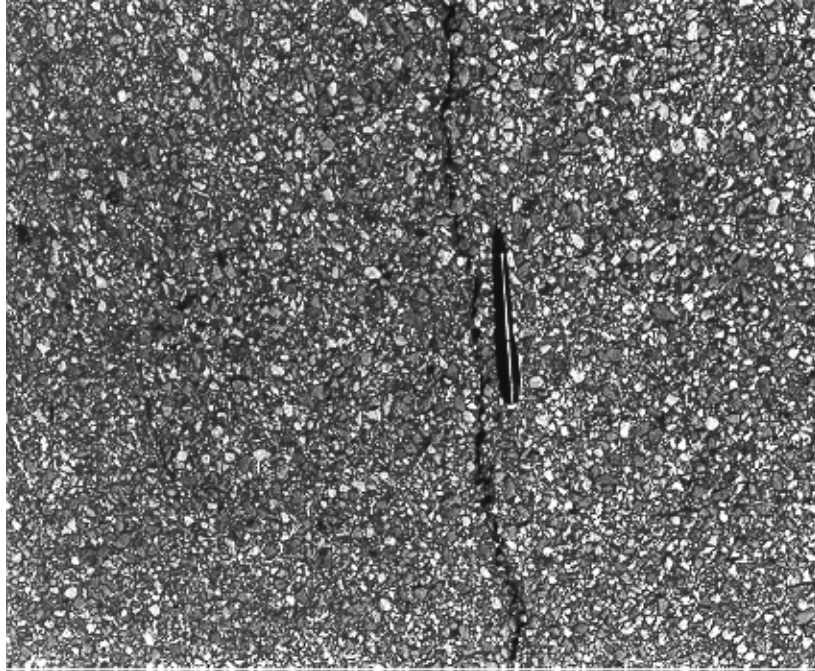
Asphalt Surface Cracking – Oso Creek/SH 286 Bridge (Zoomed View).
